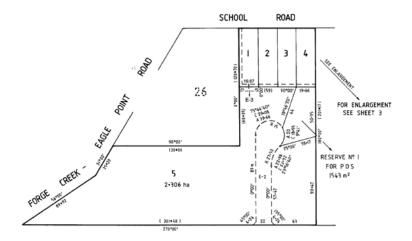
Existing Plan of Subdivision for the subject site (PS307157F)
